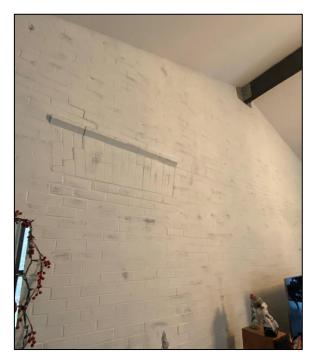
Former entryway on the interior of the subject building (Town of Halton Hills 2024)
